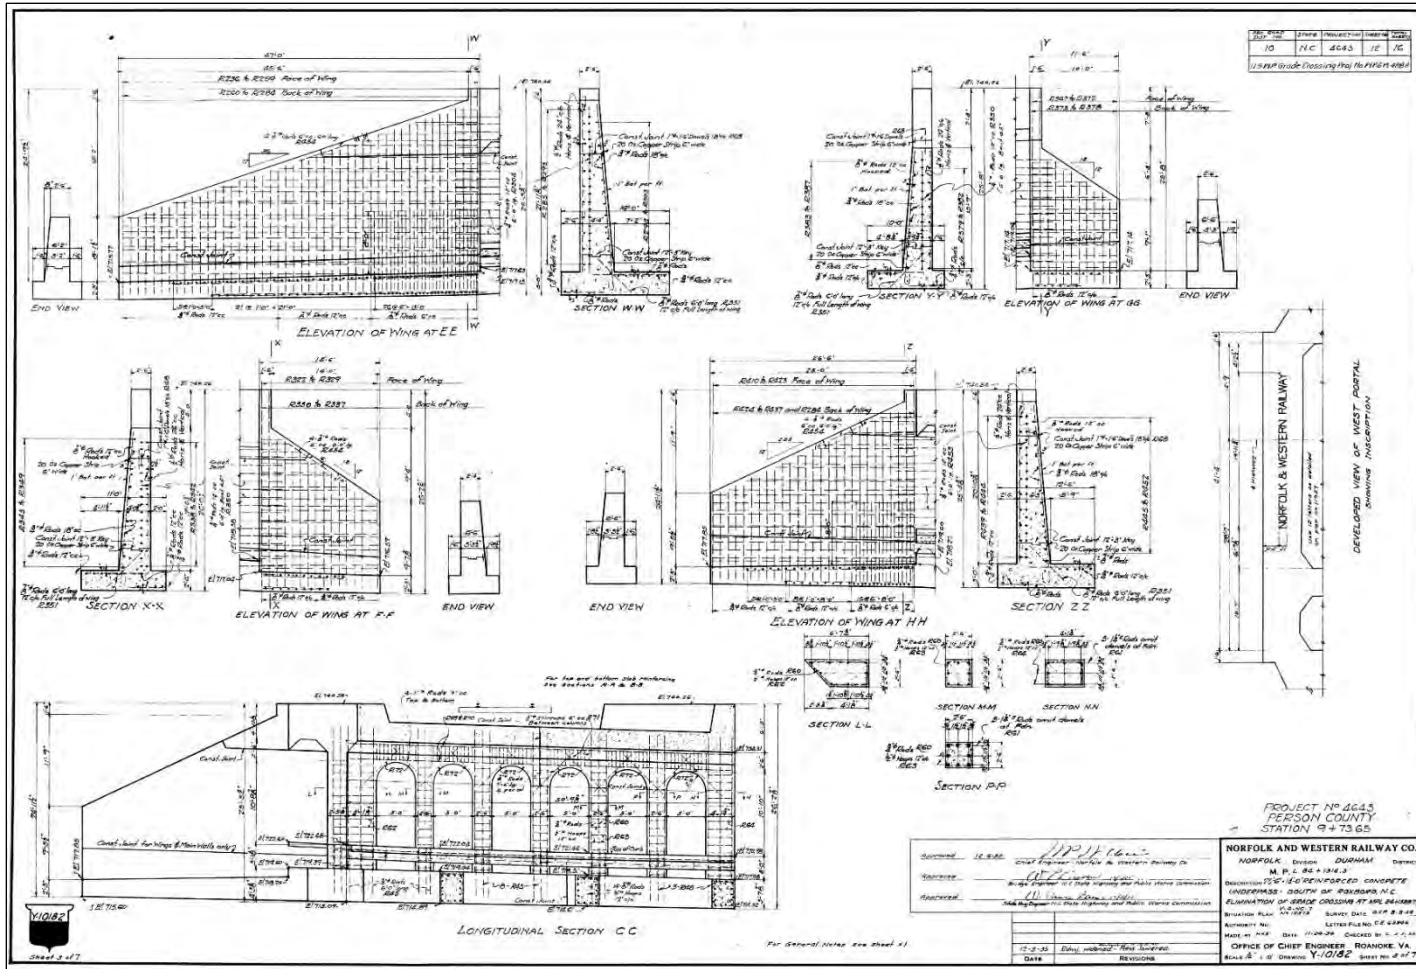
Original Drawing of Wall Details for N&W Railway Underpass South of Roxboro.<sup>747</sup>
